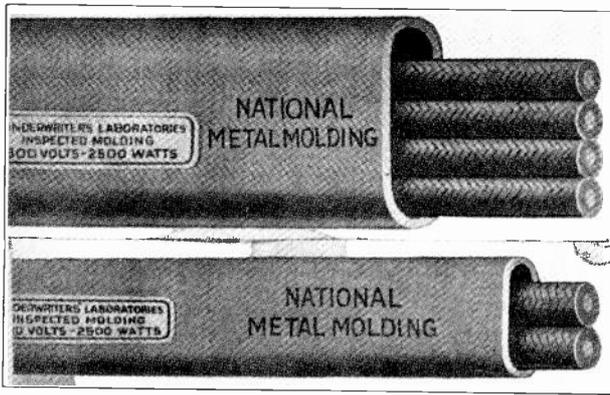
Two pieces of metal molding of a very neat appearing type for exposed wiring systems.
